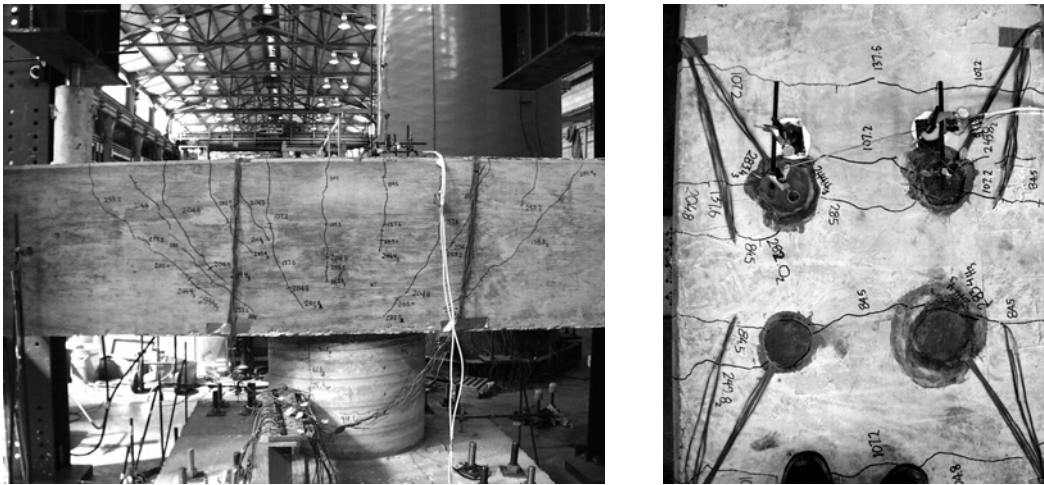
Test of Column-Bent Cap Specimen with Grouted Vertical Ducts (Matsumoto et al. 2001)
